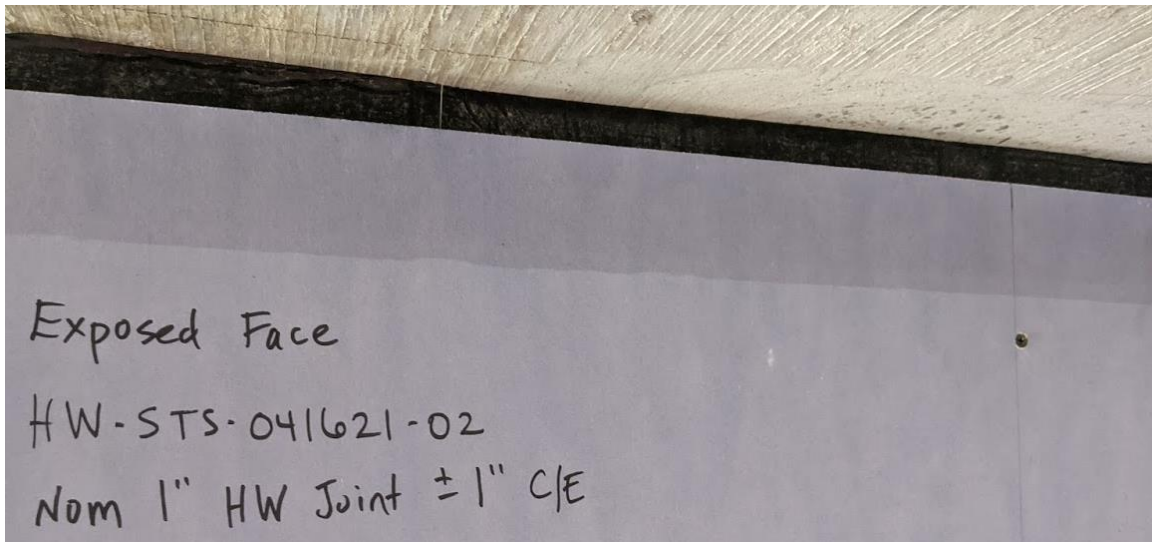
The head of wall joint installed into wall prior to movement cycling.
